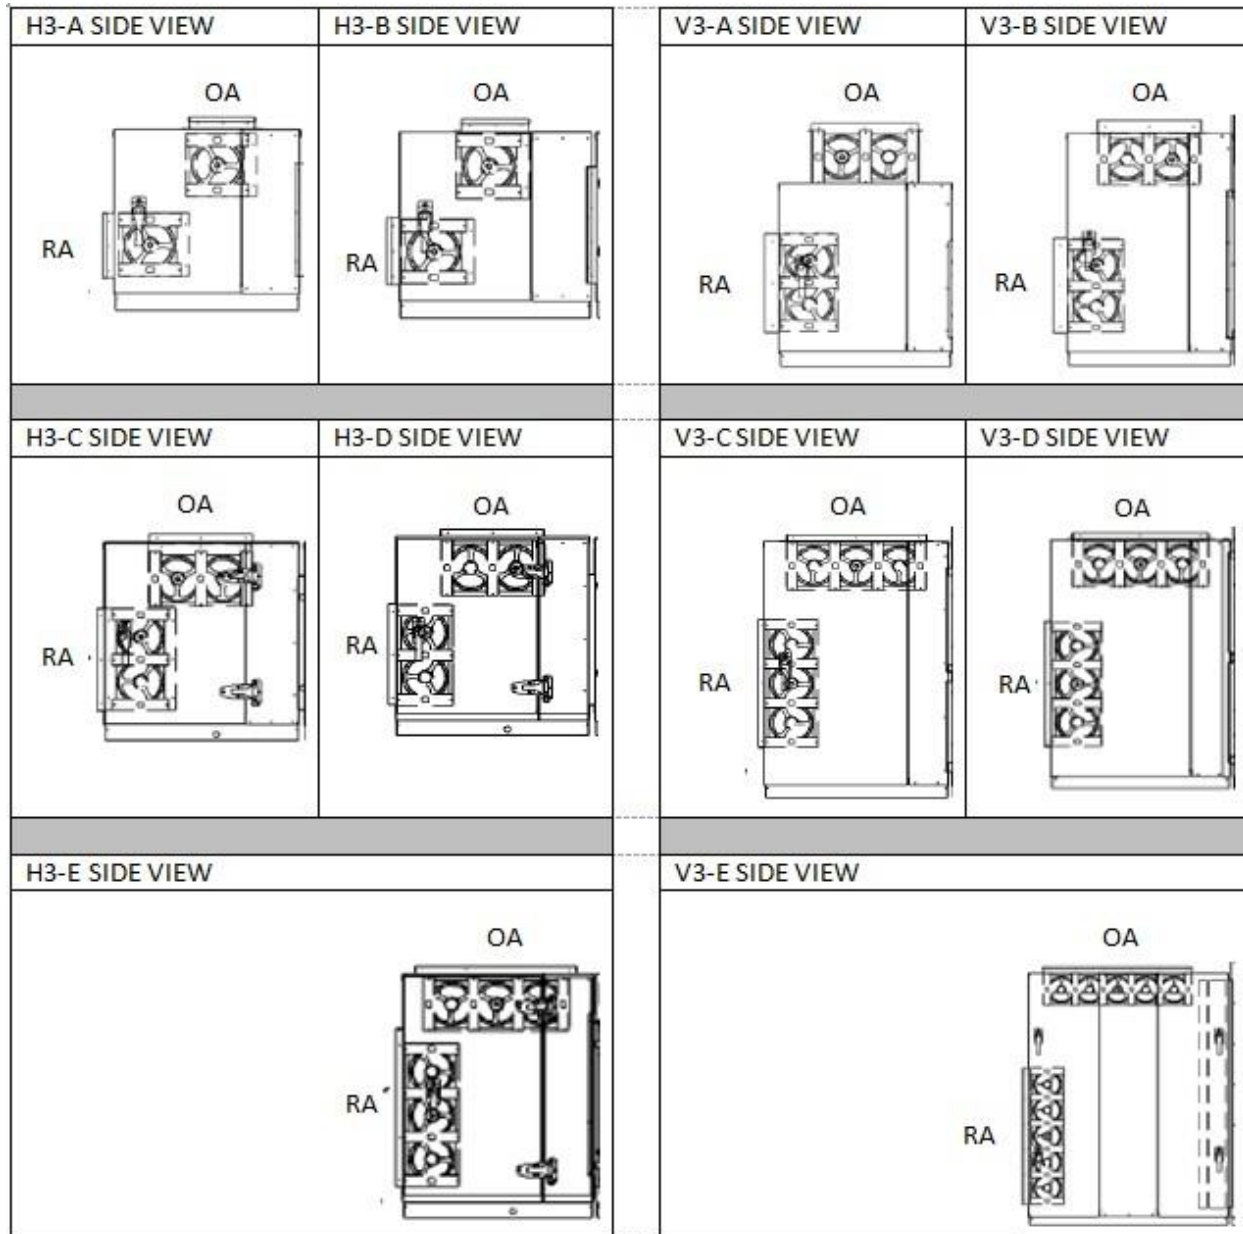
Front RA, Top OA Mixing Box Arrangements
